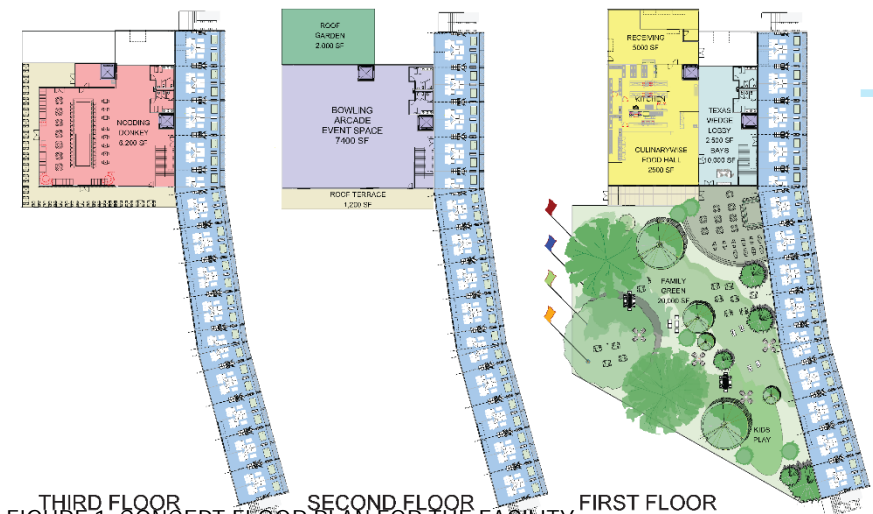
CONCEPT FLOOR PLAN FOR THE FACILITY
